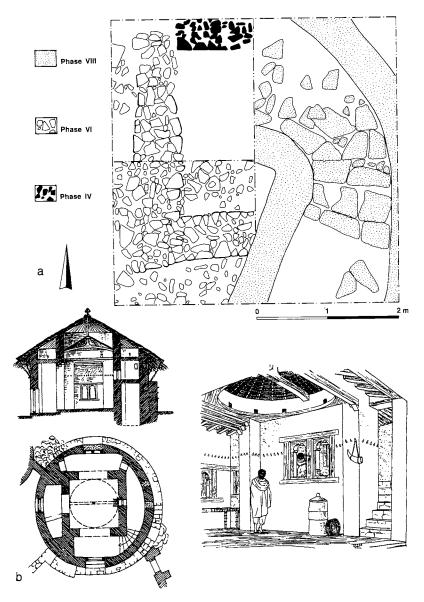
Plan of the foundations of a round house exposed in the K3 trenches, with drawings of a similar house recorded by the Deutsche Aksum-Expedition in 1906.
